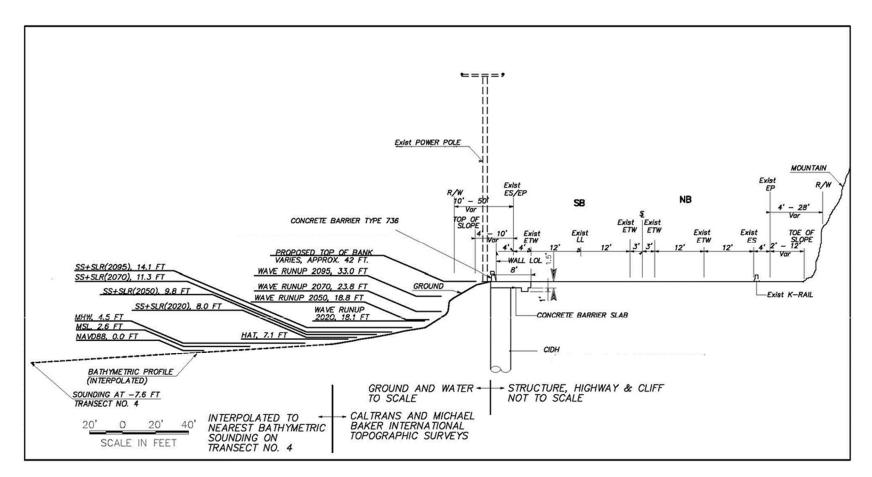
Cross section view of the proposed secant wall and applicable water levels at PM 4.2.
